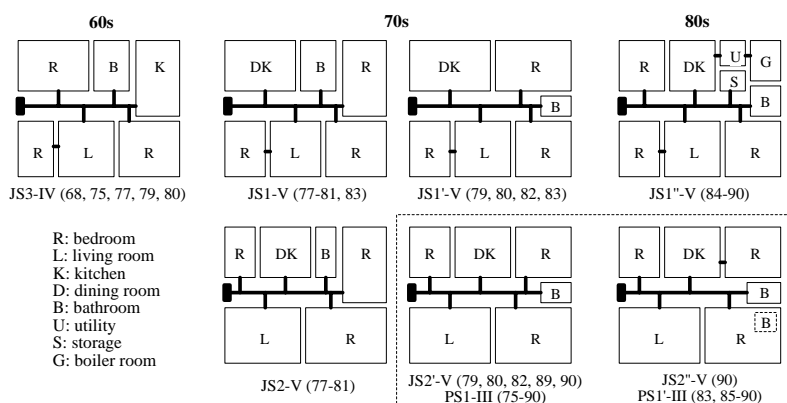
Typical 3 bedroom plans in metropolitan Seoul
